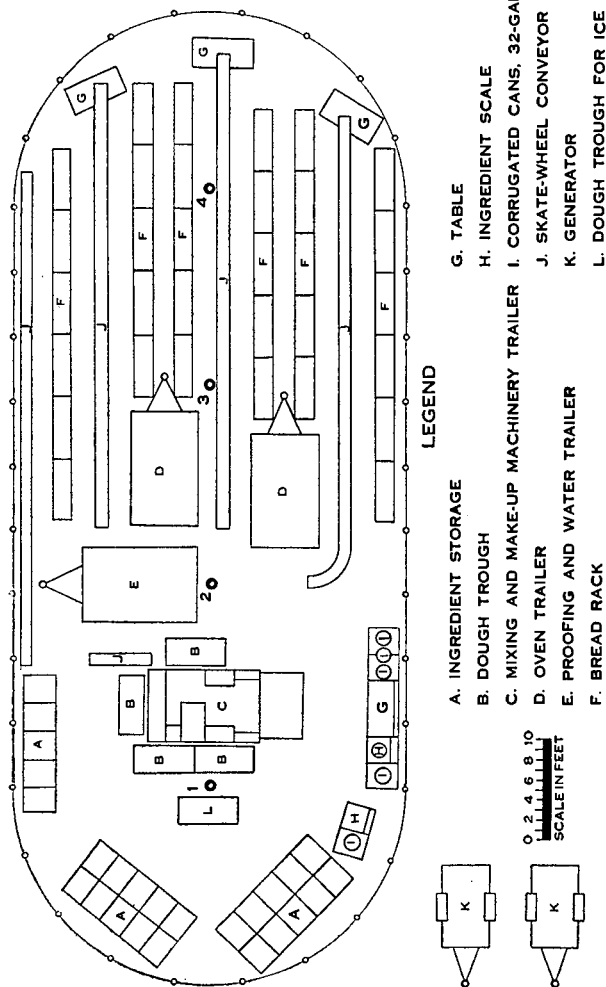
Plan for housing mobile bakery equipment in assembly tent with extra center section
